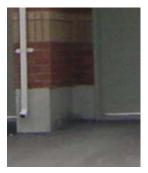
<u>Unacceptable</u> Foundation Wall Height (at garage)
